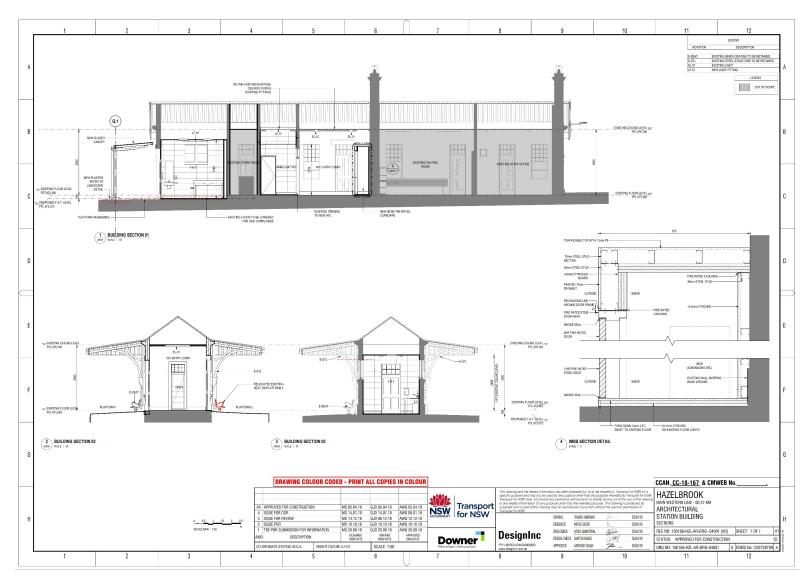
Profile drawings for similar bathroom renovation works for the TAP Hazelbrook Station platform building
